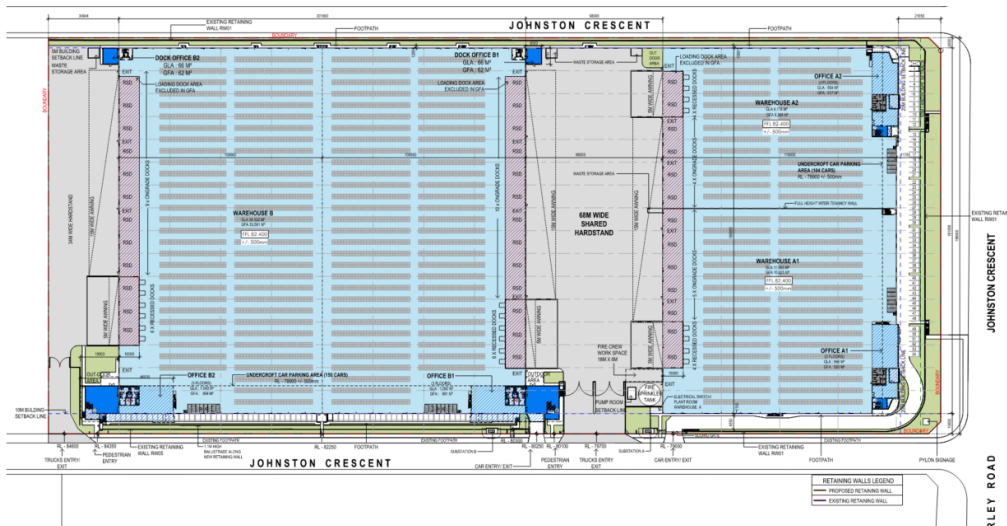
Site Plan (Source: ESR/Nettletontribe)
